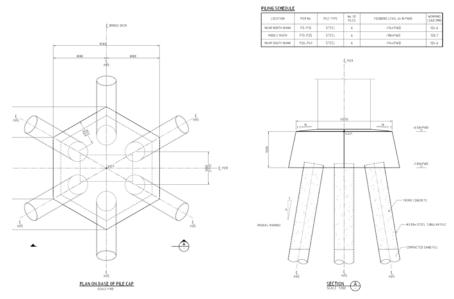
Foundation arrangement for the seismic isolation scheme: six raking steel piles
